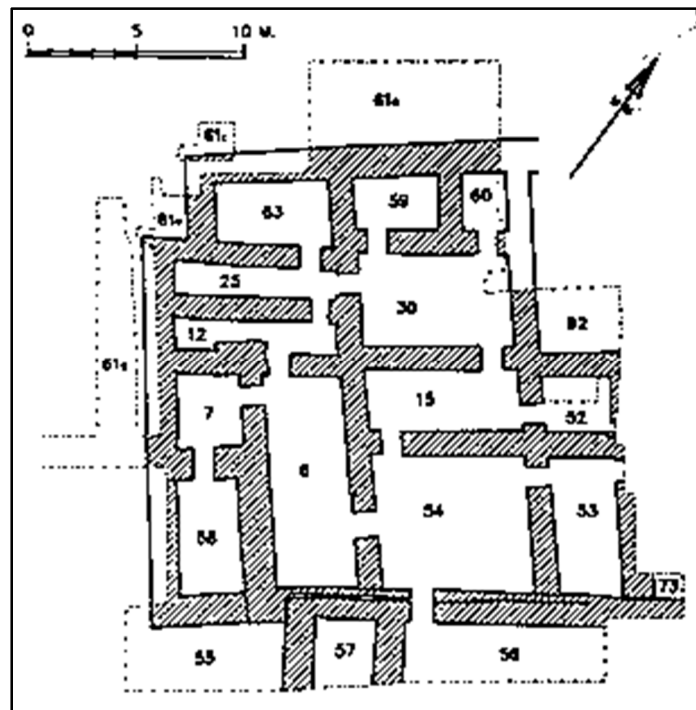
Reconstructed plan of the level III building in the WC-1 area at Nippur (after Zettler 1993)
